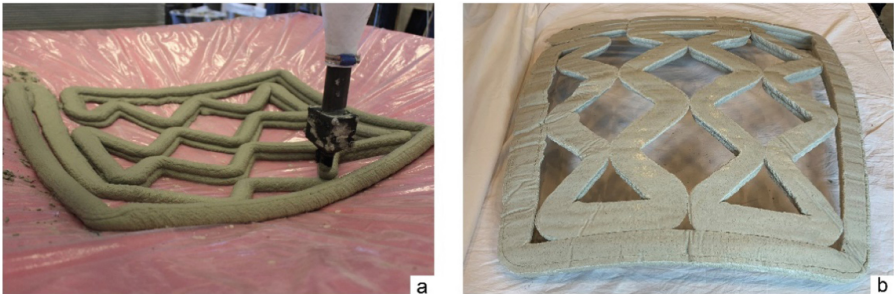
(a) Printing inner geometry for the panel. (b) The final result of the double-curved panel.
